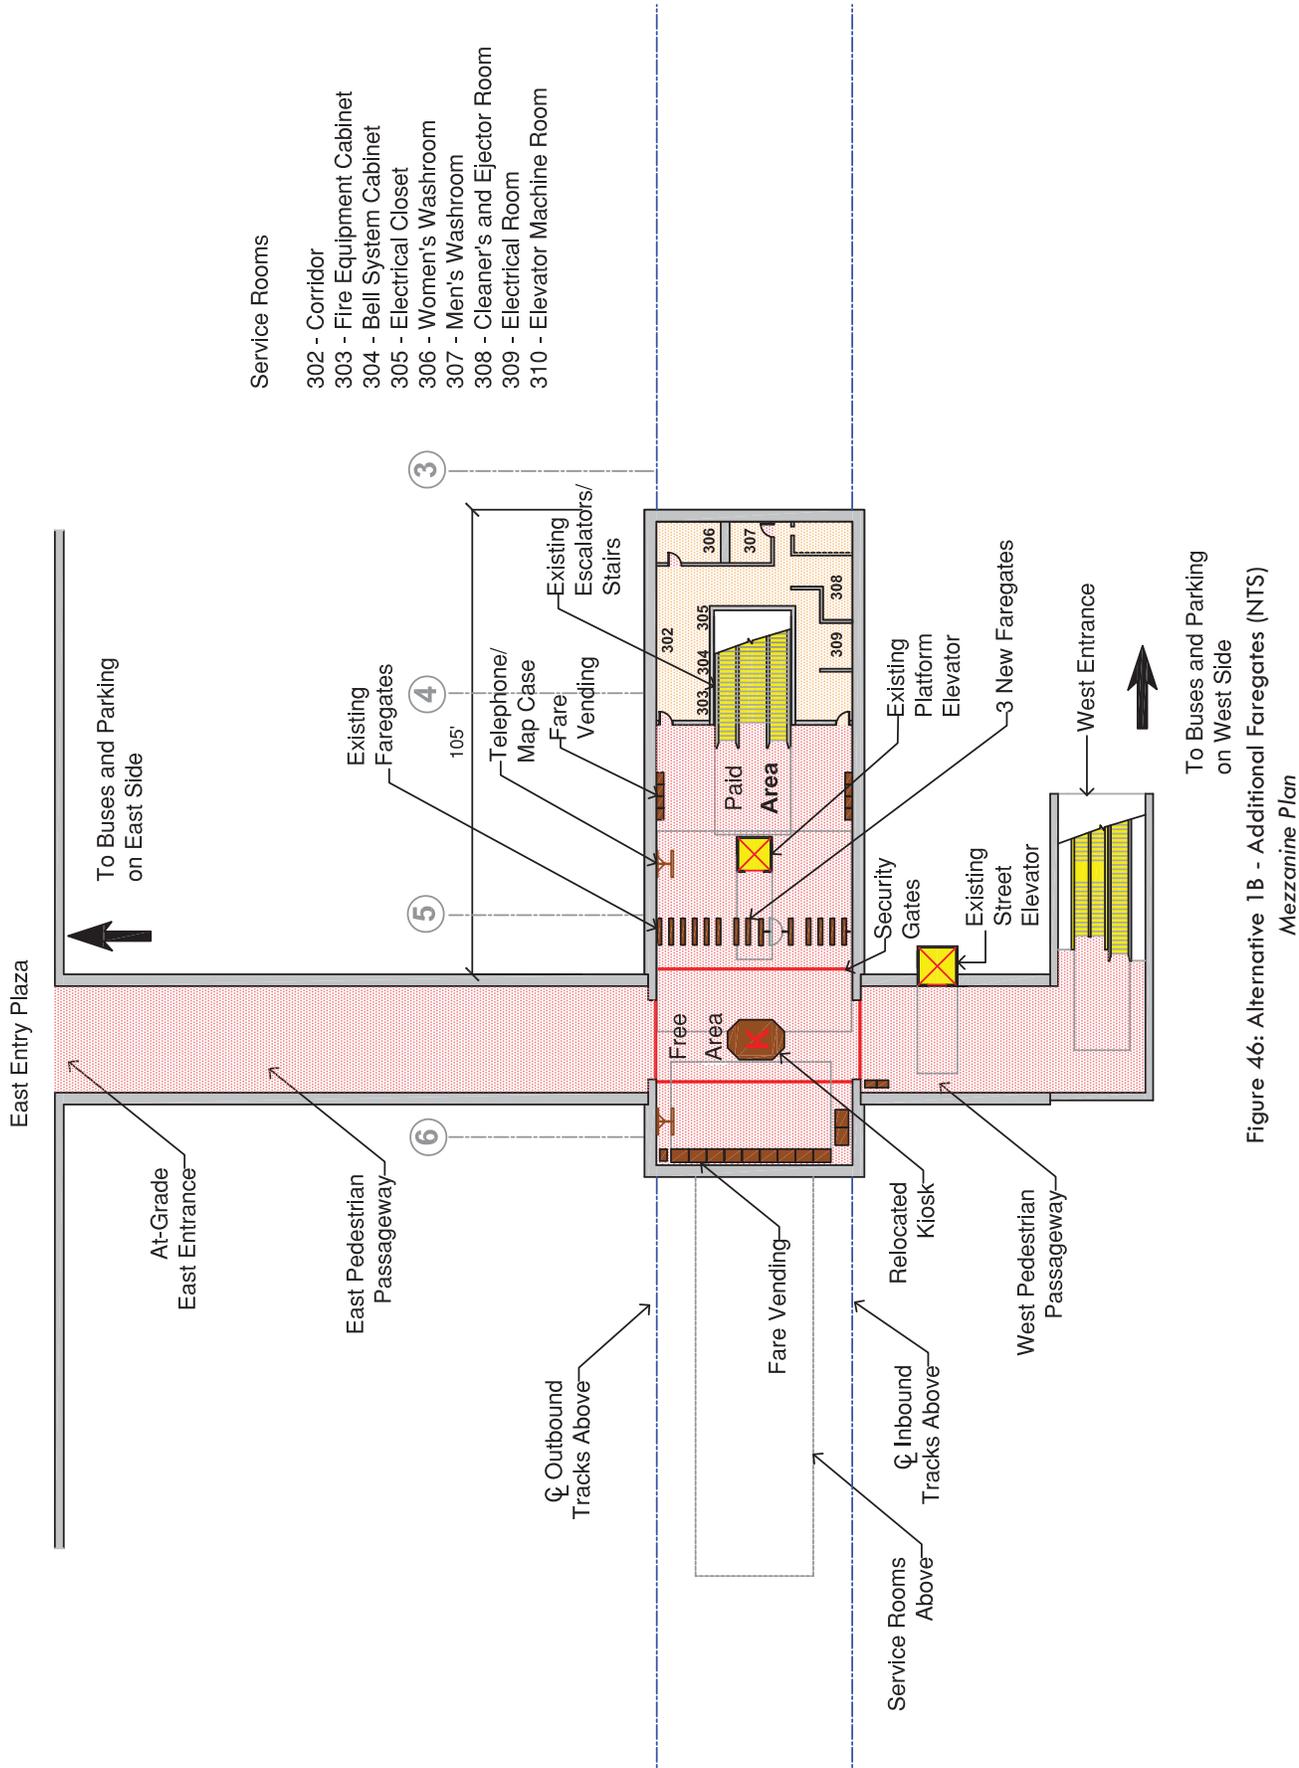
Alternative 1B - Additional Faregates (NTS) Mezzanine Plan
